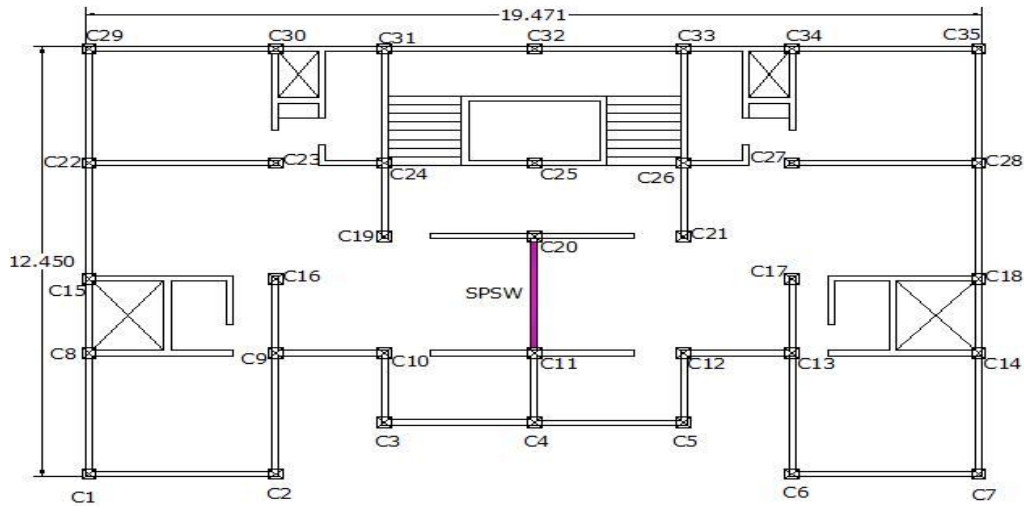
Plan showing Steel frame building with SPSW2 (Model 2)
